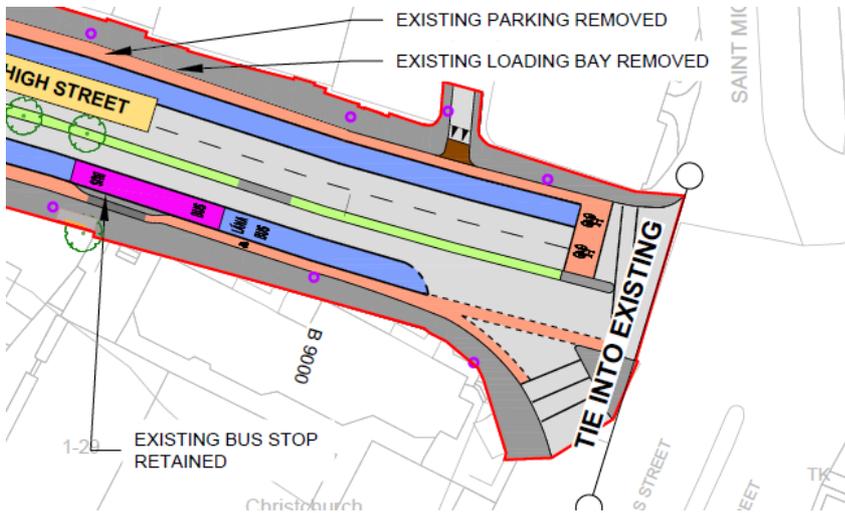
The Preliminary Design of the Proposed Scheme at the Junction of High Street and Winetavern Street with the Existing Layout
